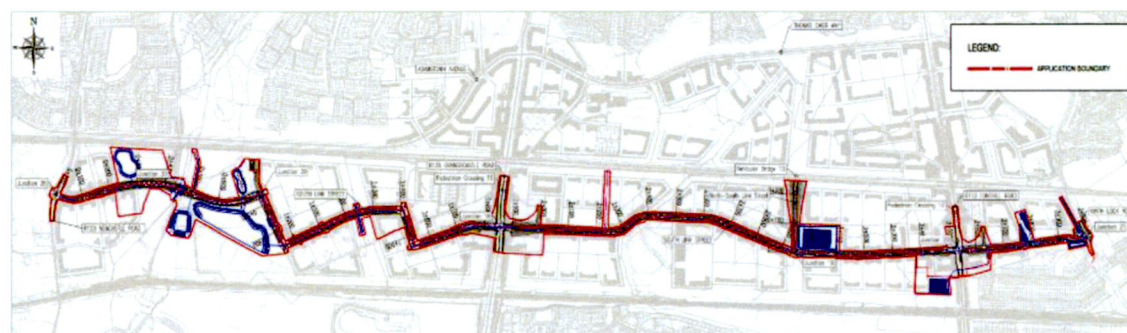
Proposed Clonburris Southern Link Street Scheme and Surrounding Existing Road Network
